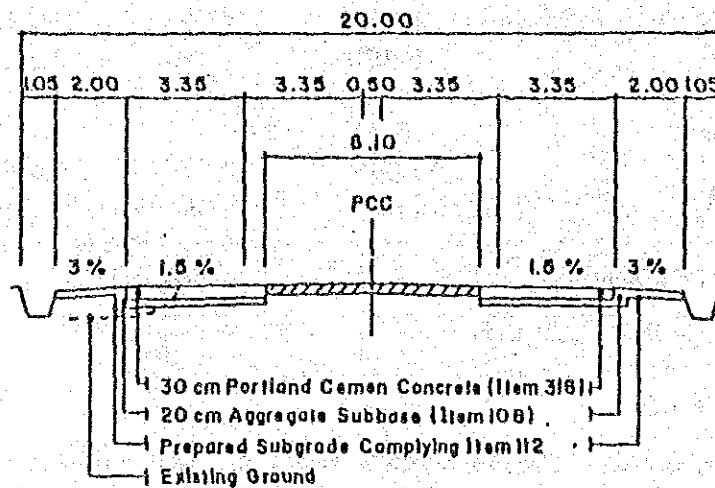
PROPOSED WIDENING TO FOUR LANES CALAMBA - STO. TOMAS SECTION
